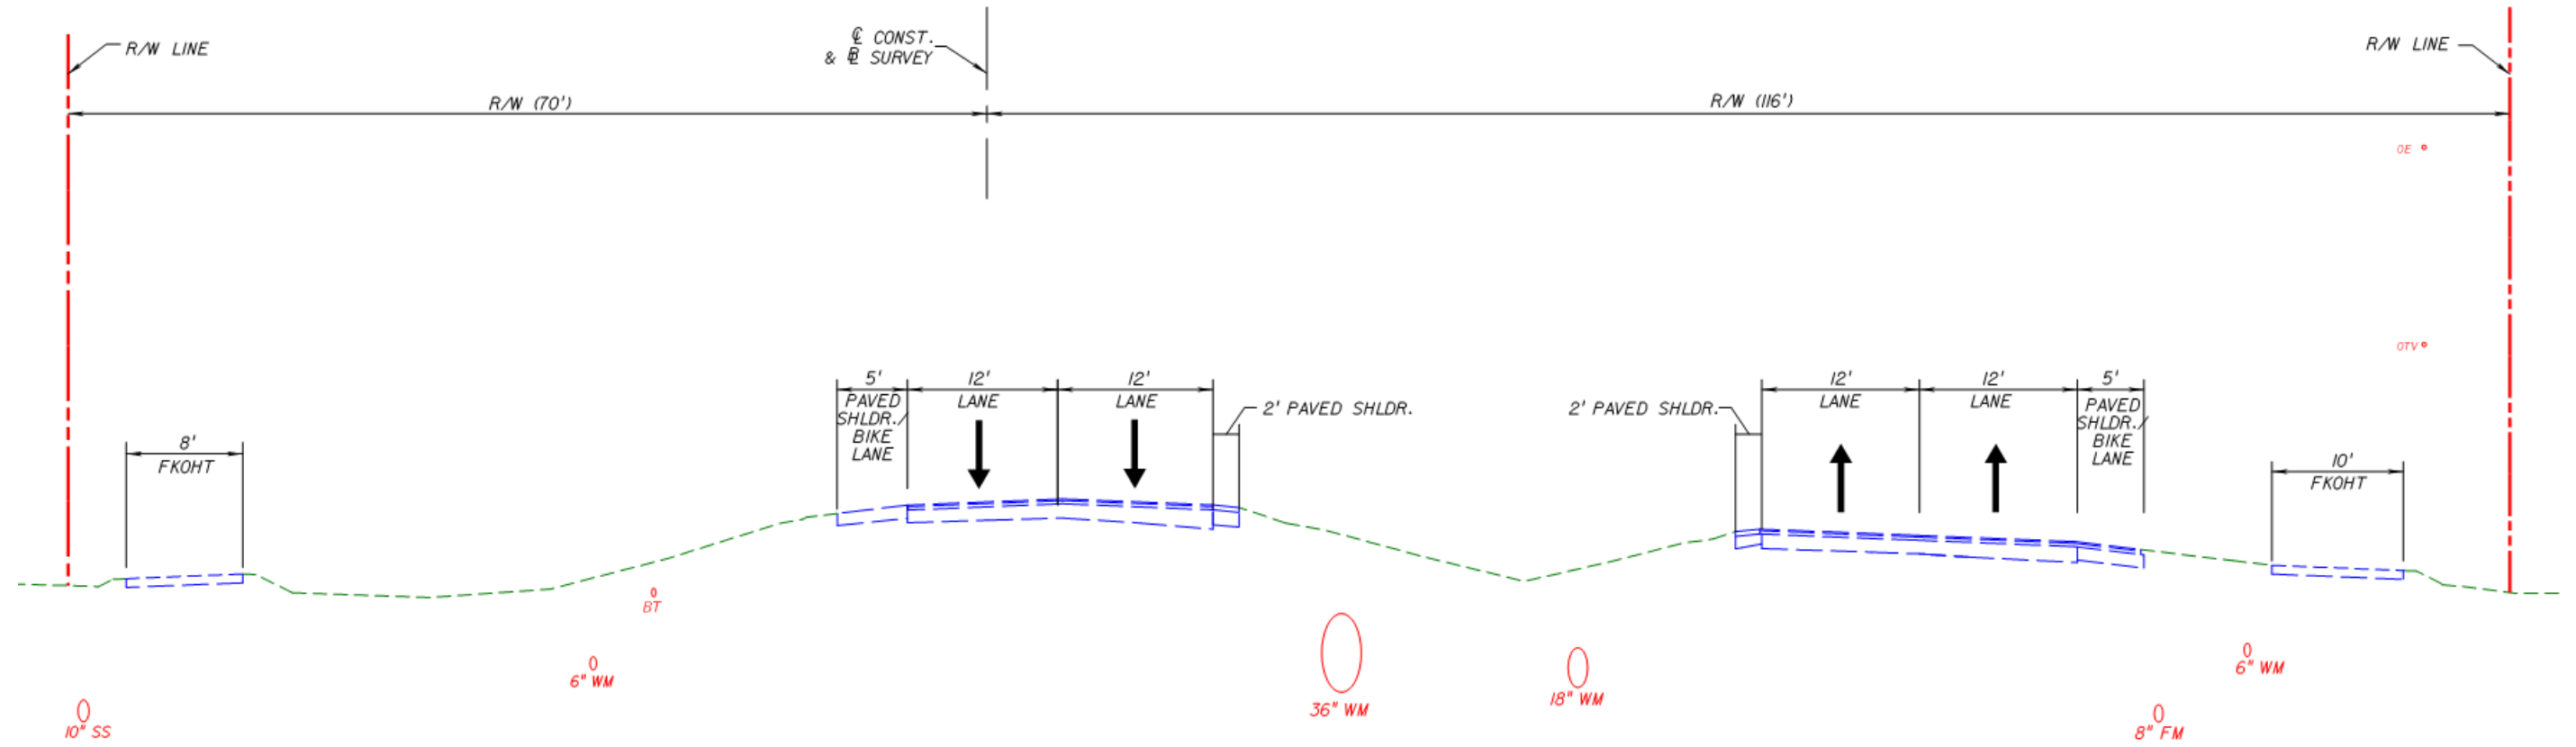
Location 3 (MM ±104.6) Existing Typical Section
